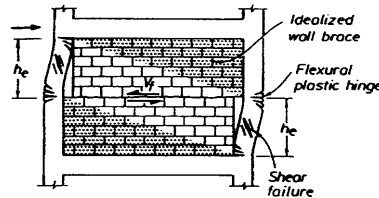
Knee-braced frame model for sliding shear failure of Masonry infill (Pauley & Priestly 1992)
